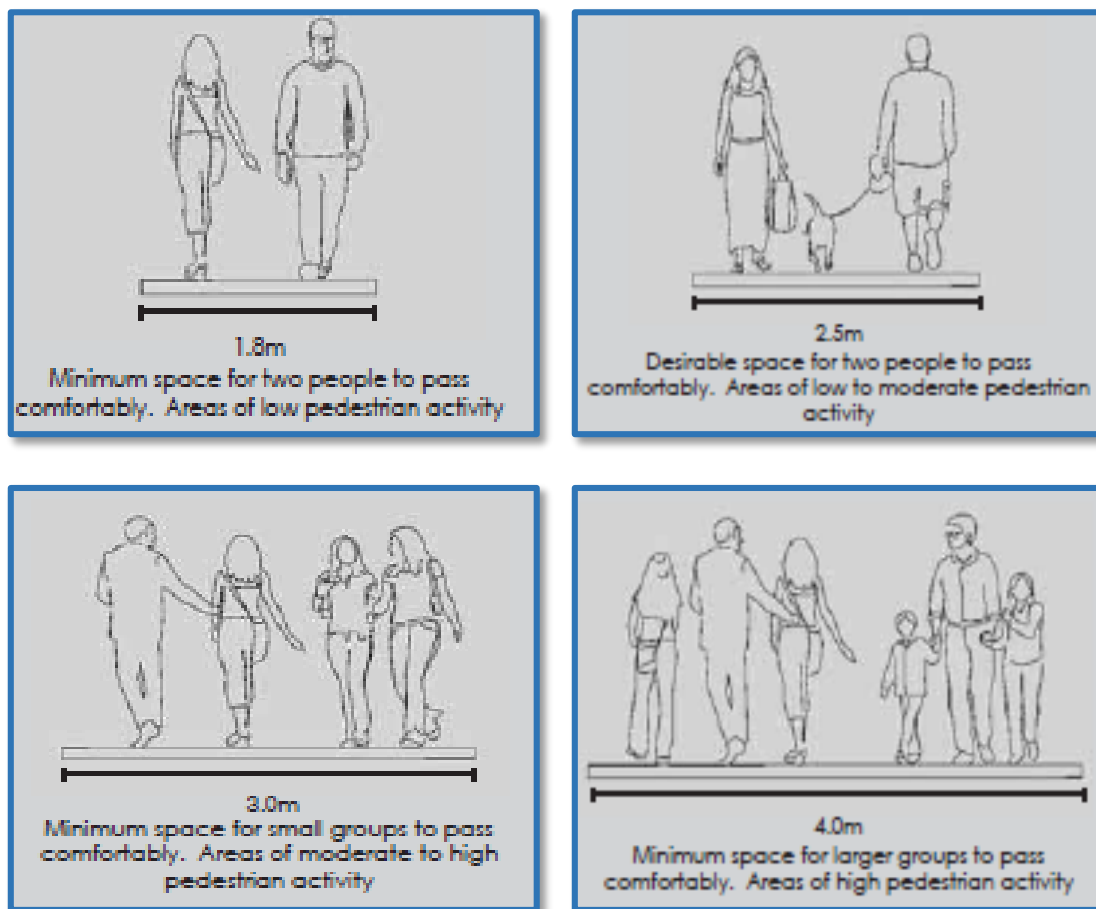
Sidewalk width requirements (Statens and Vegdirektoratet, 2014)
